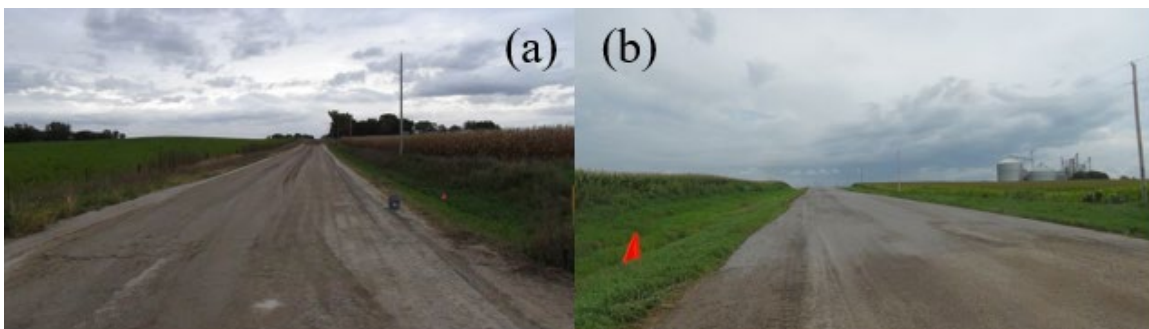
RAP sections at end of construction: (a) Cherokee and (b) Howard County
